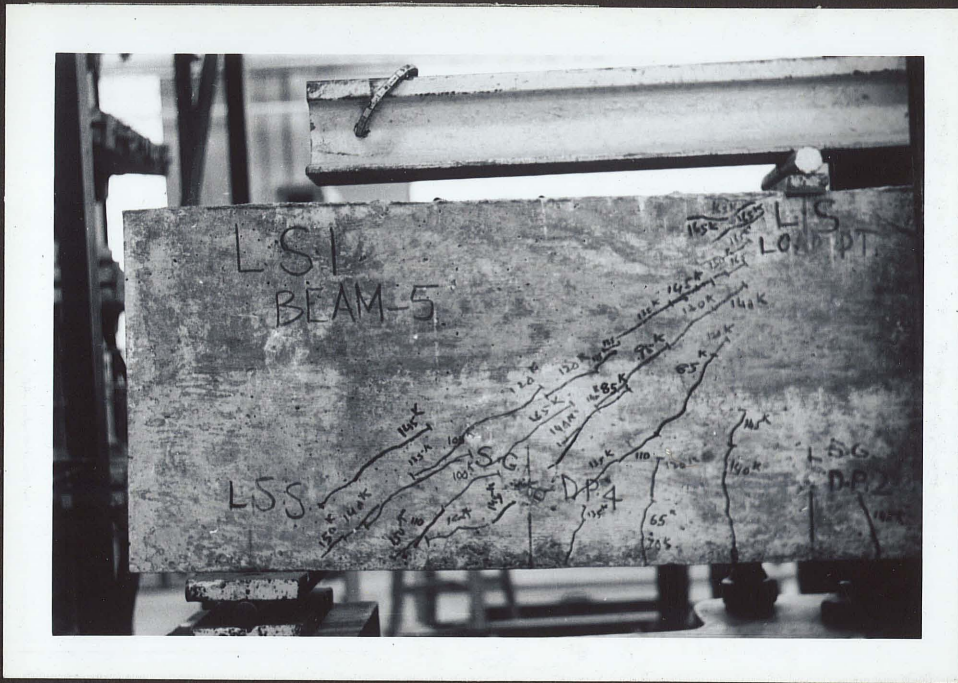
Beam 5: Close View of Side L.S.1 at Failure
